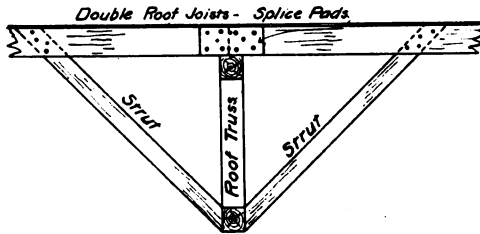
METHOD OF TRUSSING ROOF JOISTS.
